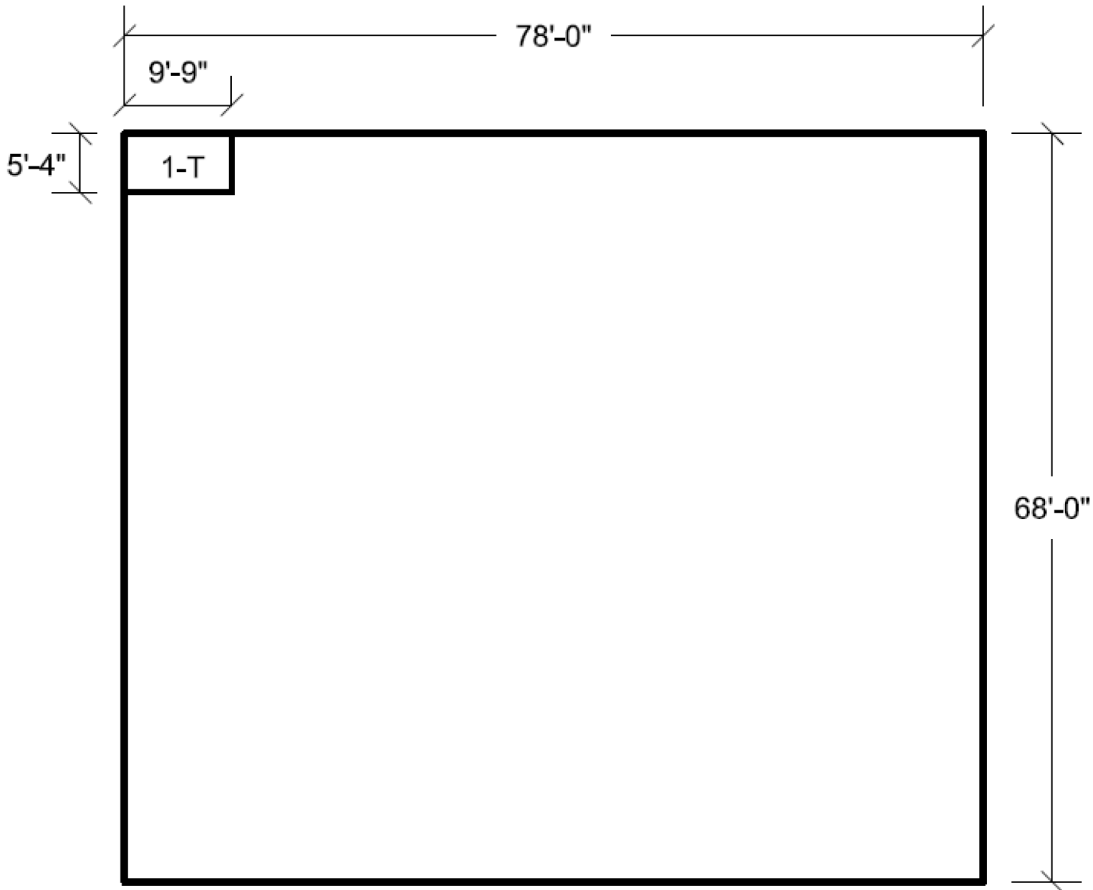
H.6-78A Pump House Internal West Wall Looking West Transverse Reinforcement Zones
